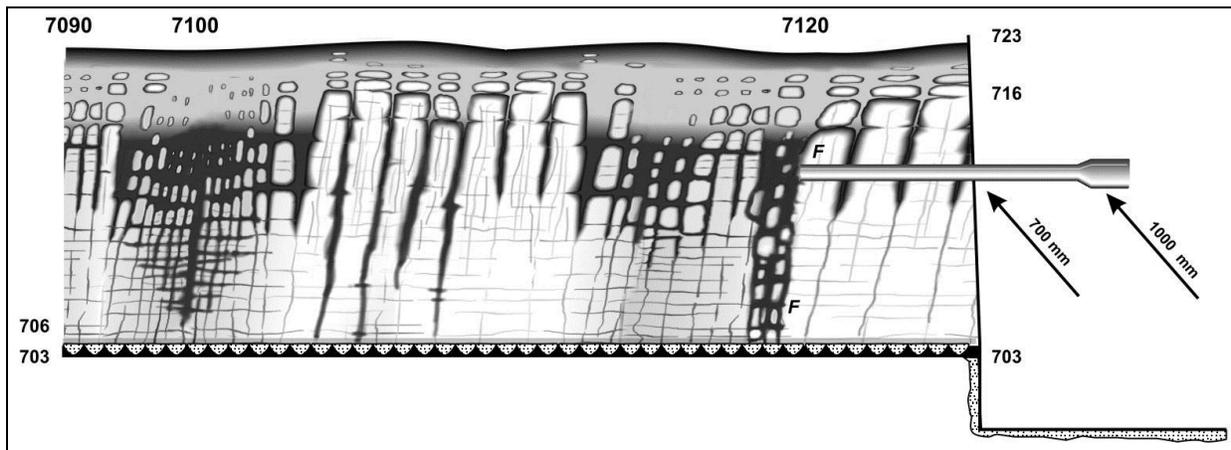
The symbolic fractured pipe, with the change of cross-section and possible raised water pressure occurring in just the wrong location. Rua Capri pavement is at ch 7120 m.
